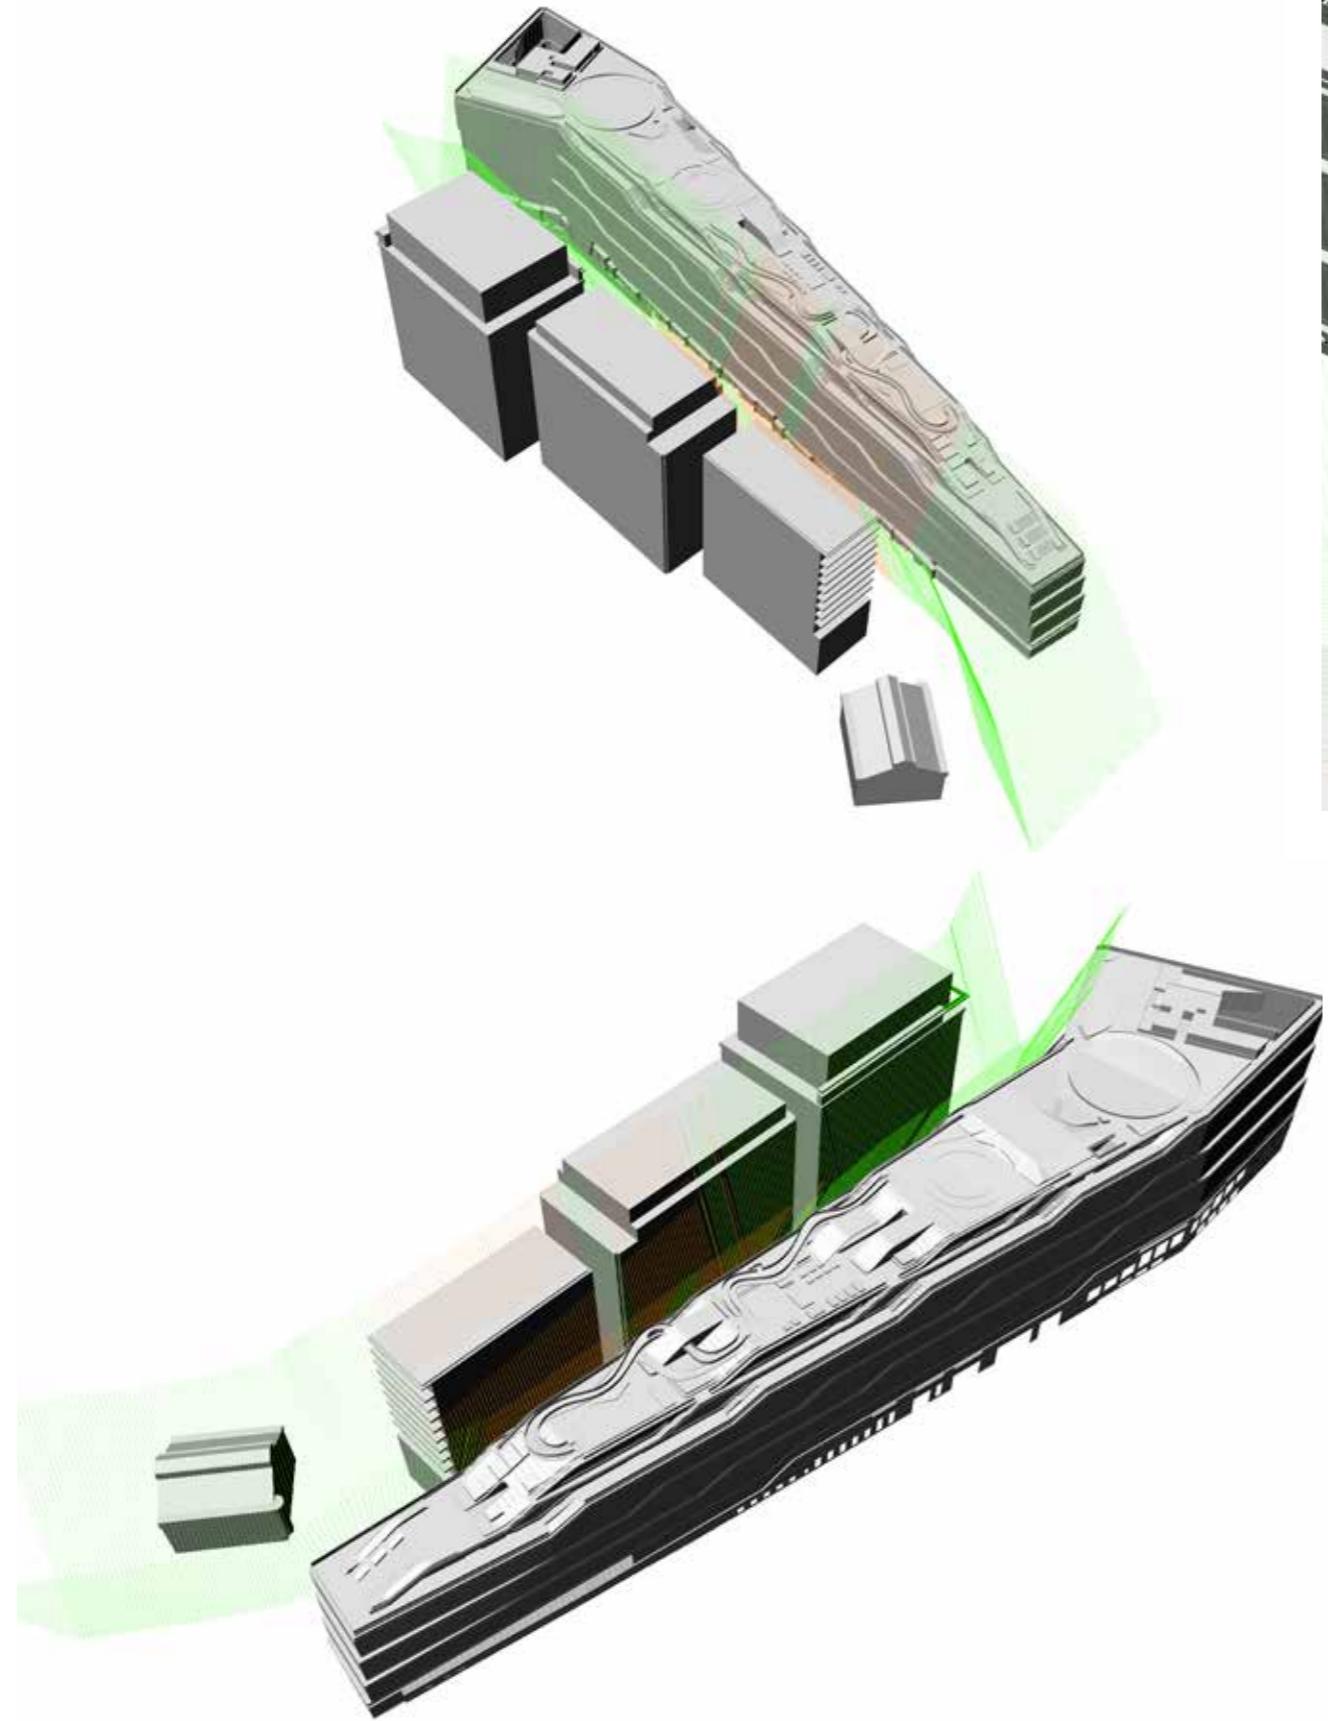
Light Cone modelling for the Zone A Building along King's Boulevard and Battle Bridge Place
